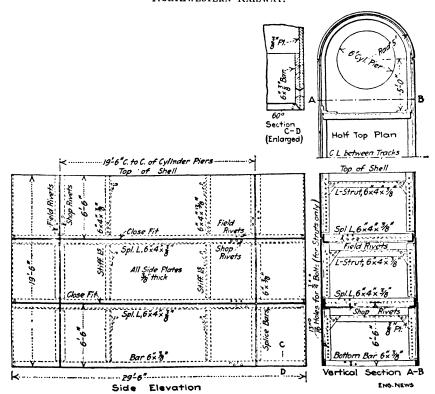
Steel Shell for Base of Cylinder Piers of the Oxford Mill Pond Bridge, Chicago & Northwestern Railway.
